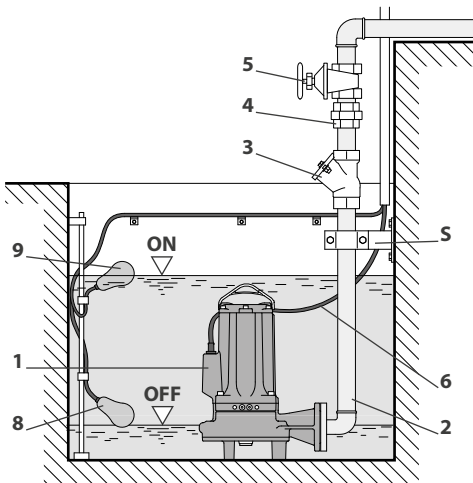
Fixed installation of a three-phase electric pump.
